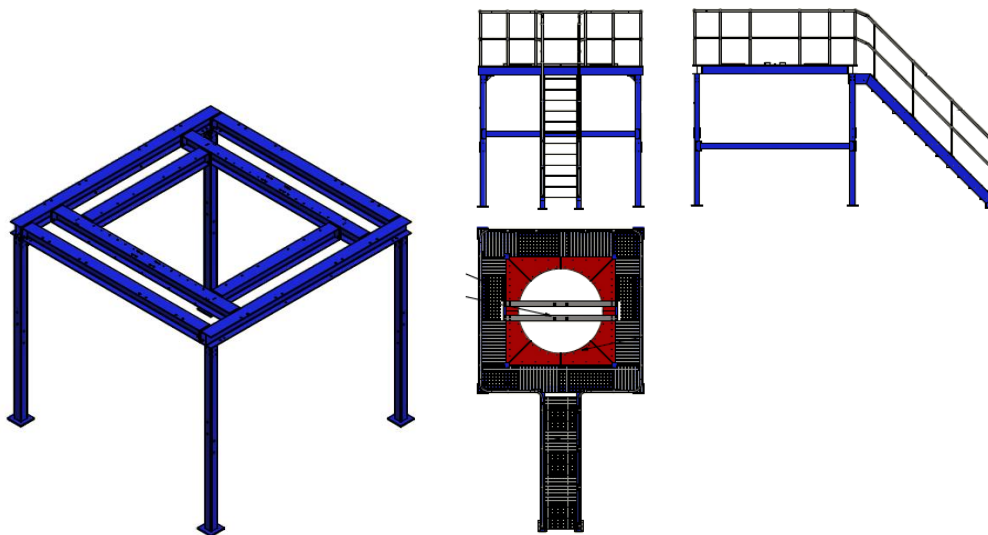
MSACC Structure (Left) with floor, walkway grid and railing (Right)
